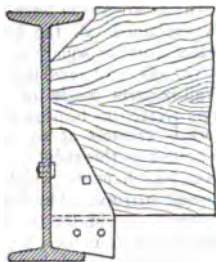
Duplex I-beam Shelf-hanger. Joists Raised Less than Four Inches
